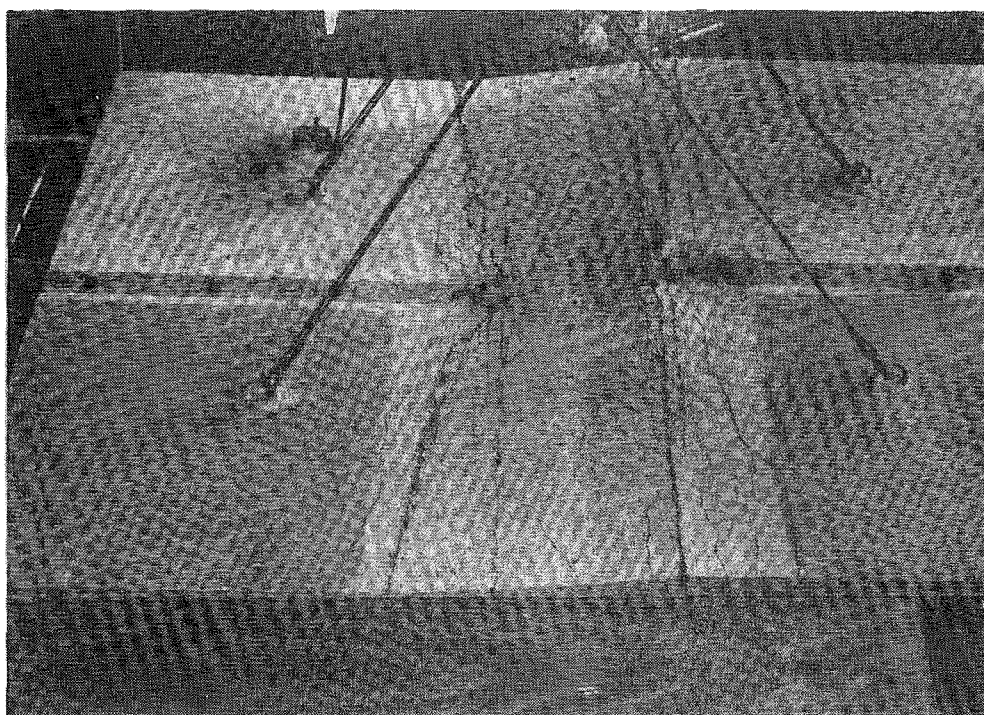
UNIT 3 AFTER DISASSEMBLY.
